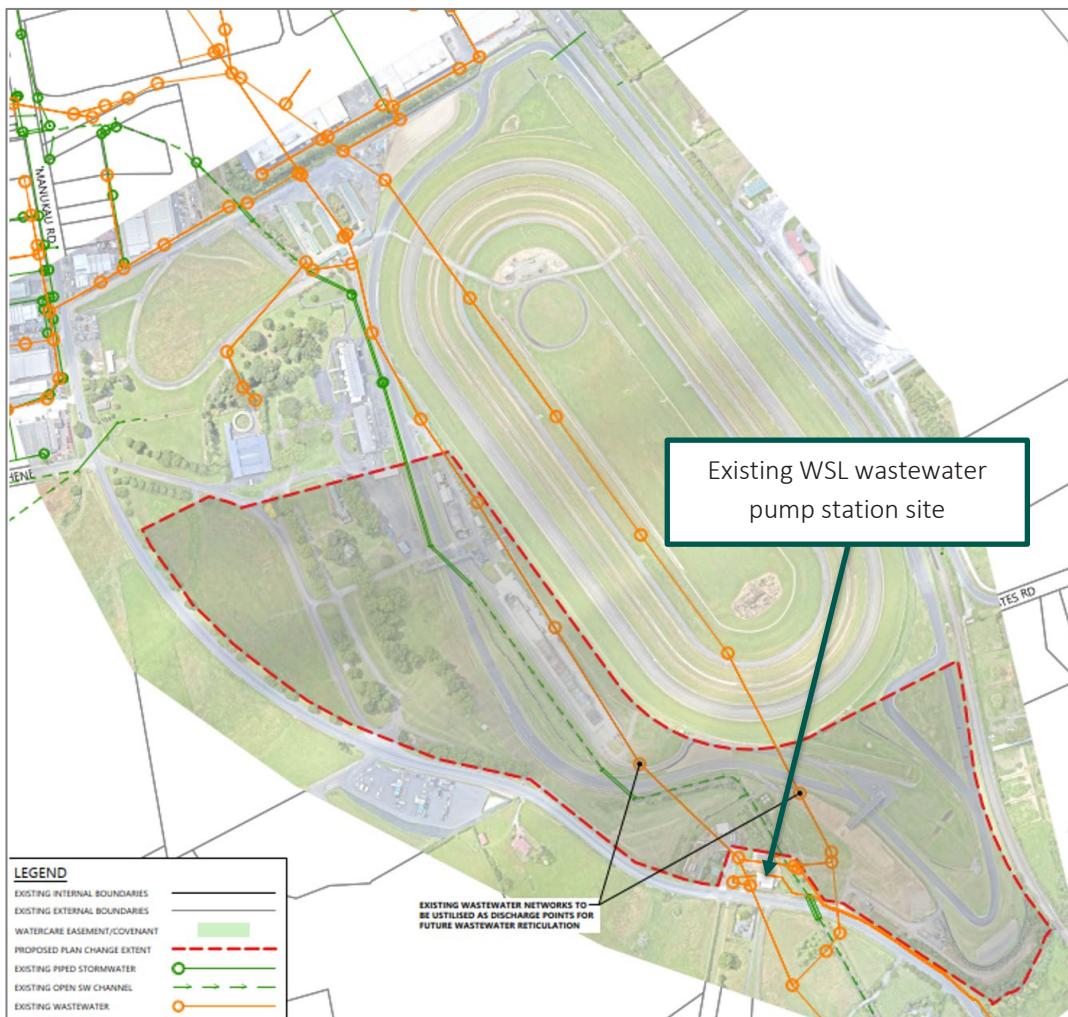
Wastewater servicing strategy proposed. Source: Woods.
